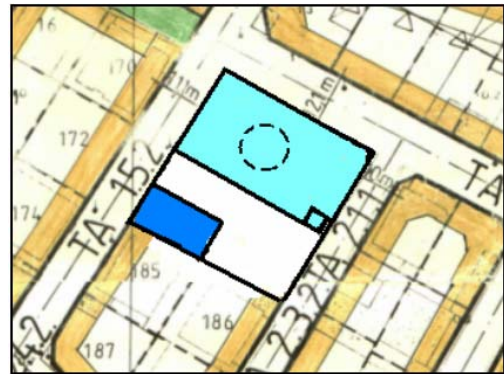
Al-Yarmoak Mosque, Site Plan
